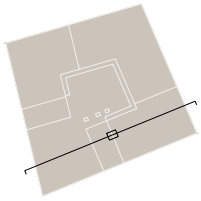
Detail 3: Wooden railing connection with facade wall 1:20
